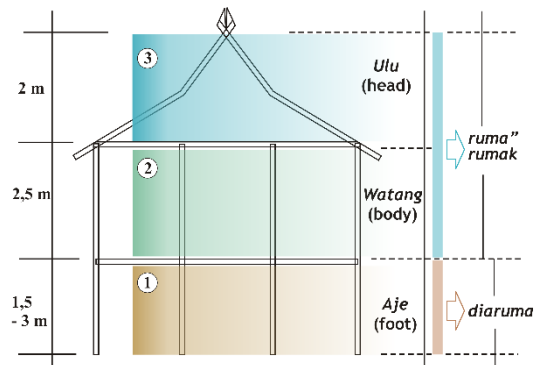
Illustration of an Orthogonal (vertical) Section of a Bajo Tribe Stilt House
